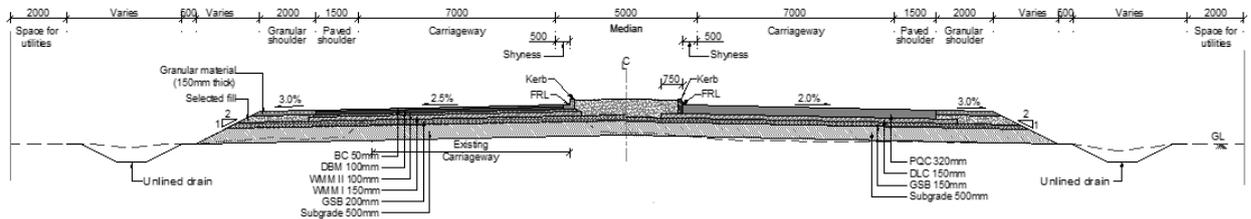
TCS 1A.4- 4 Lane Rural Area (Left Side Existing Road)
